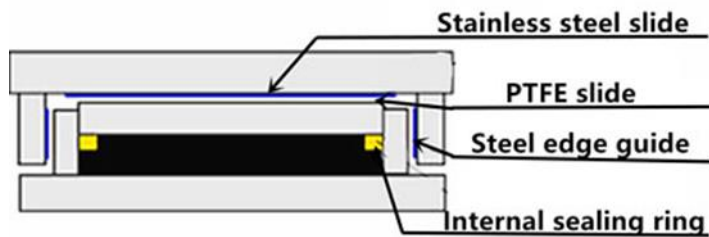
Cross-Sectional View of a Fixed Pot Bearing
